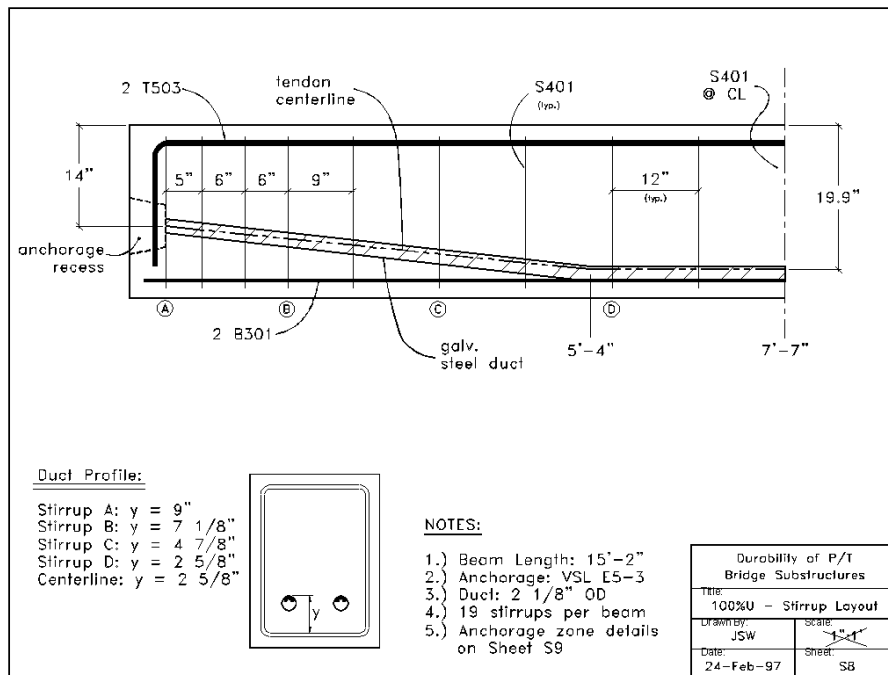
Sheet S8: 100%U Stirrup Layout 4.2
